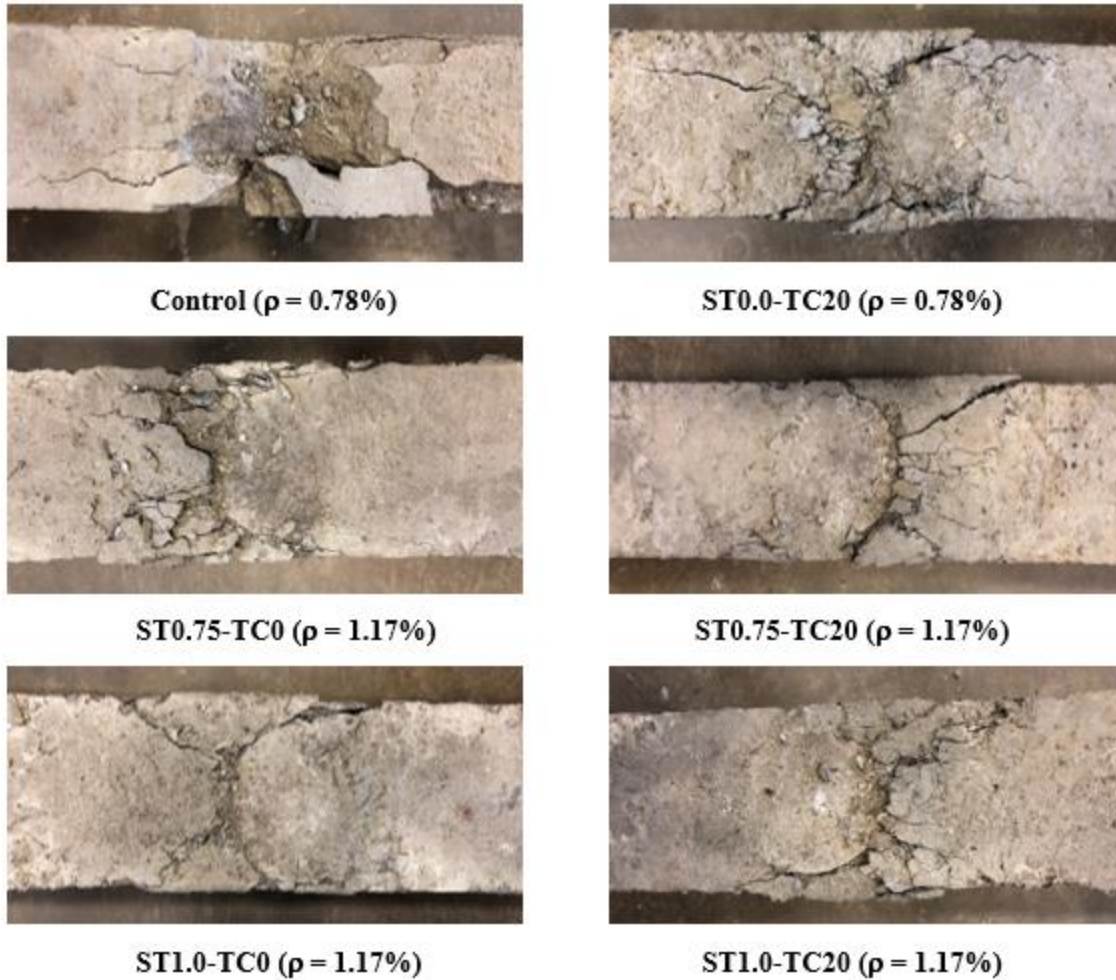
Photos. View of contact surface of fractured impact beam specimens.
